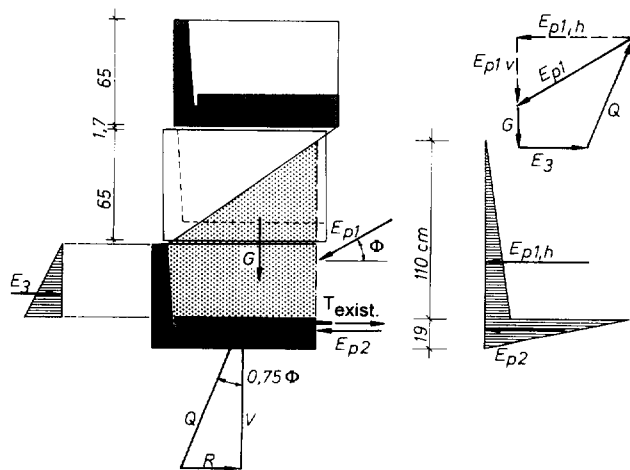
Forces on the facing element of a loop anchor wall system and force polygon for the soil fill on the concrete element.
